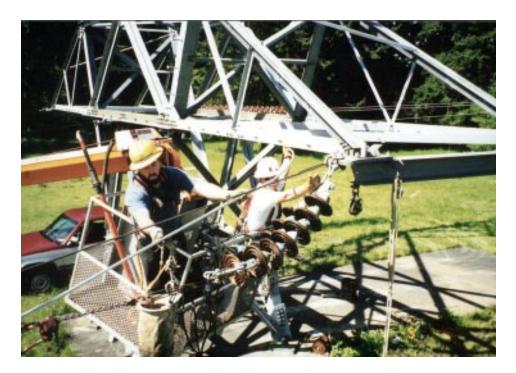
A pair of ratcheting cutters is used to cut the steel cored aluminum conductor.
